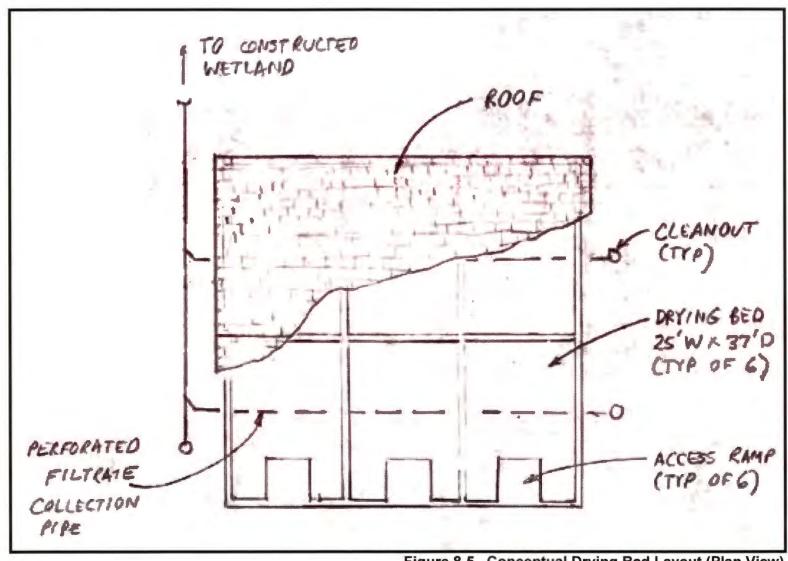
Conceptual Drying Bed Layout (Plan View)
